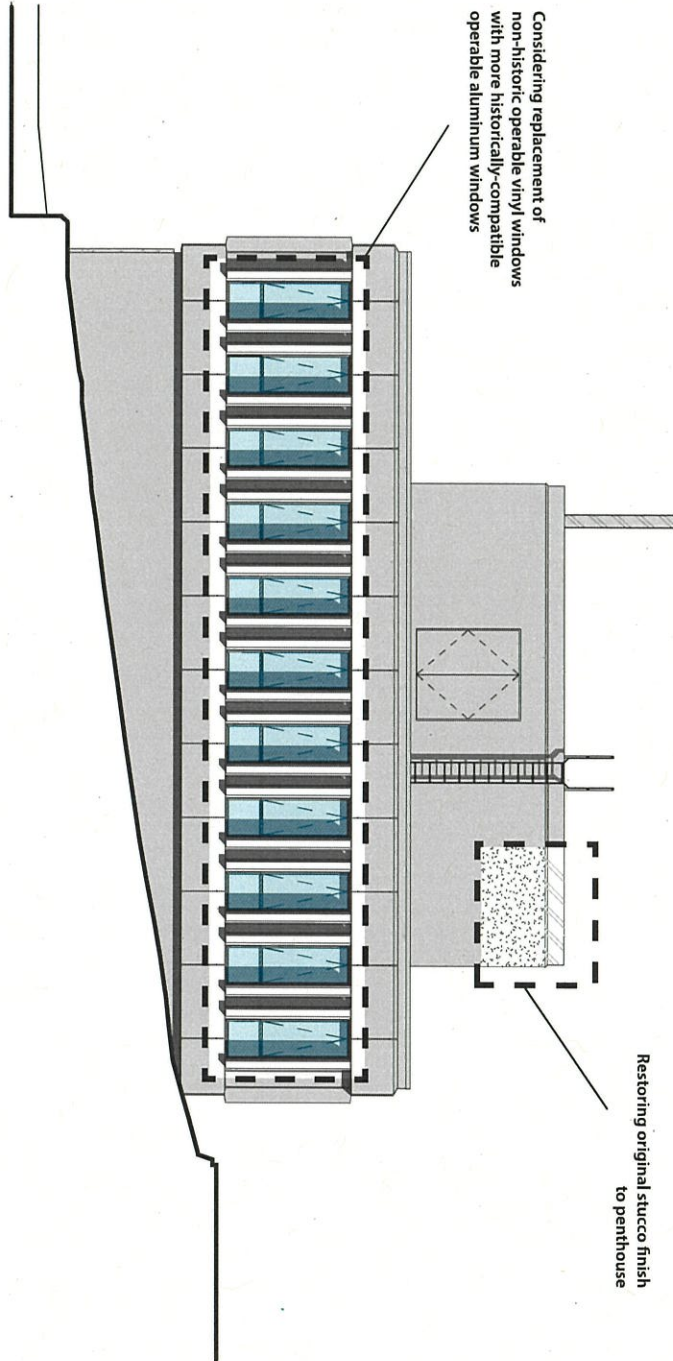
SOUTH ELEVATION - PRELIMINARY DESIGN
